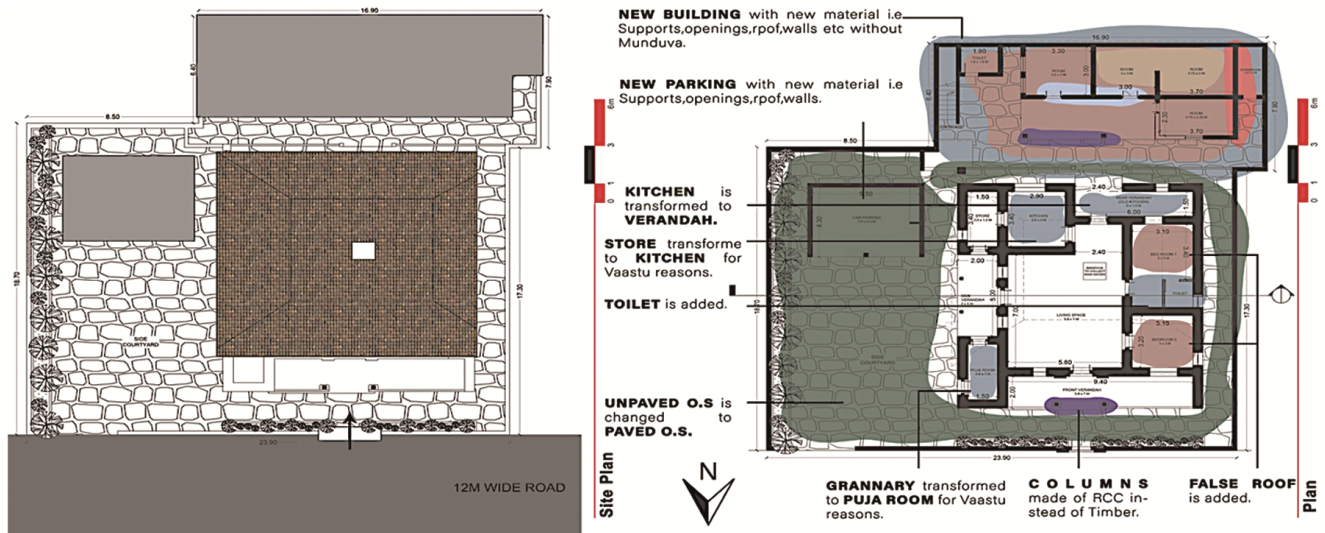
Site Plan and Plan of the vernacular house showing the vernacular house (including transformation) and the new non-vernacular house
